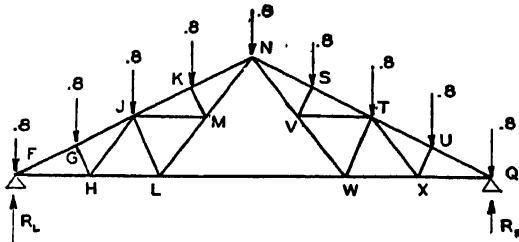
Skeleton Layout for Industrial Building Roof Truss, with Dead Load Panel Point Forces.
